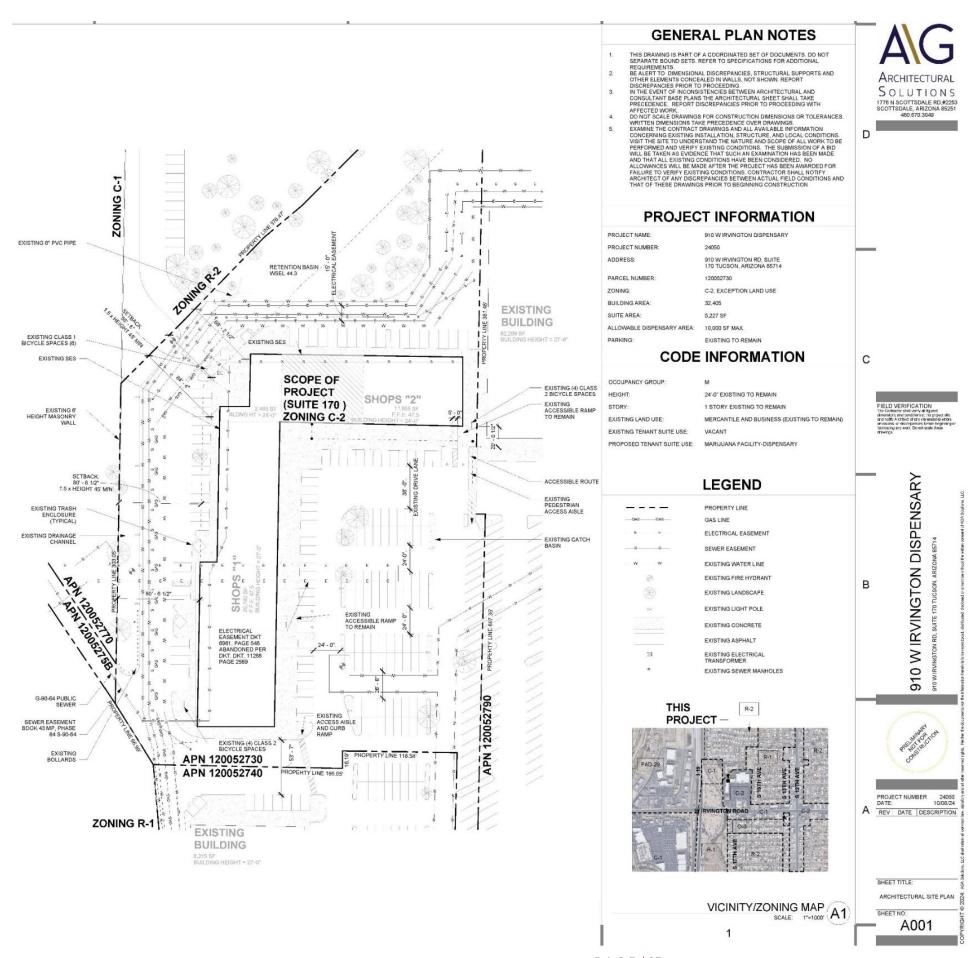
EXHIBIT III.A: PRELIMINARY DEVELOPMENT PLAN
